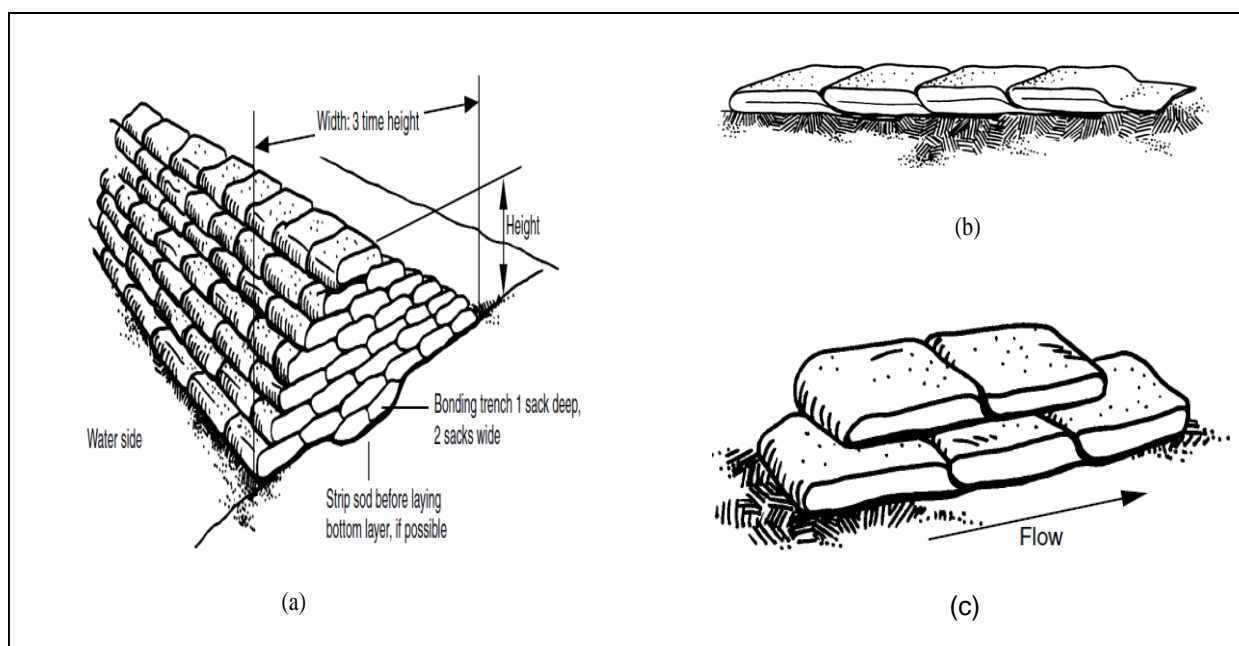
Stacking Sand Bags for Construction of a Bund(left, a) Lapping of Sand Bags (right top, b) and Placing of Sand Bags (c)
